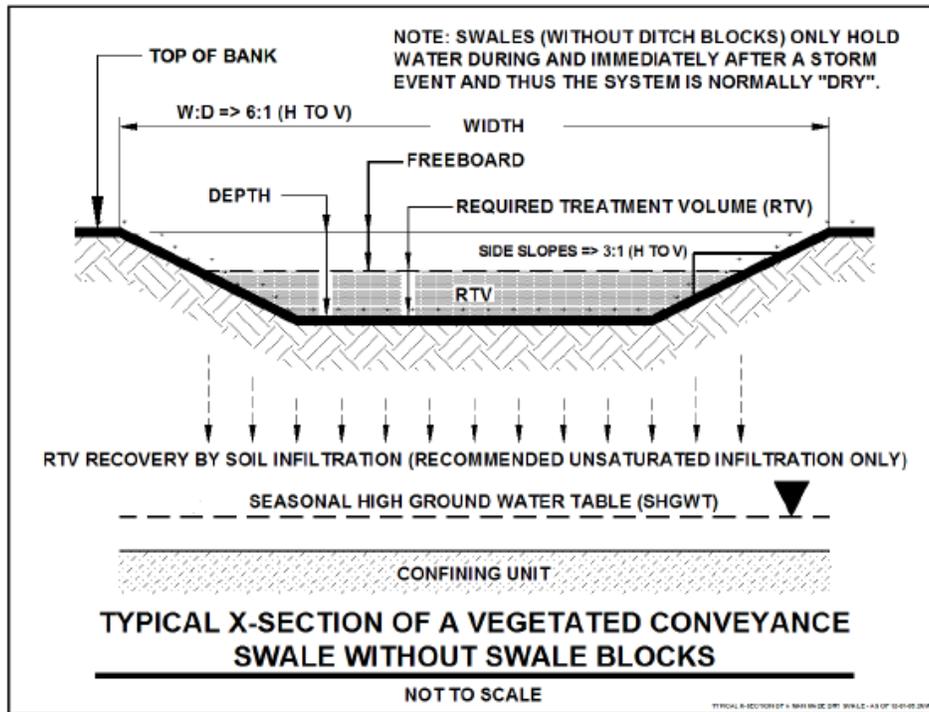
Typical Cross-section of a Vegetated Conveyance Swale without Swale Blocks
